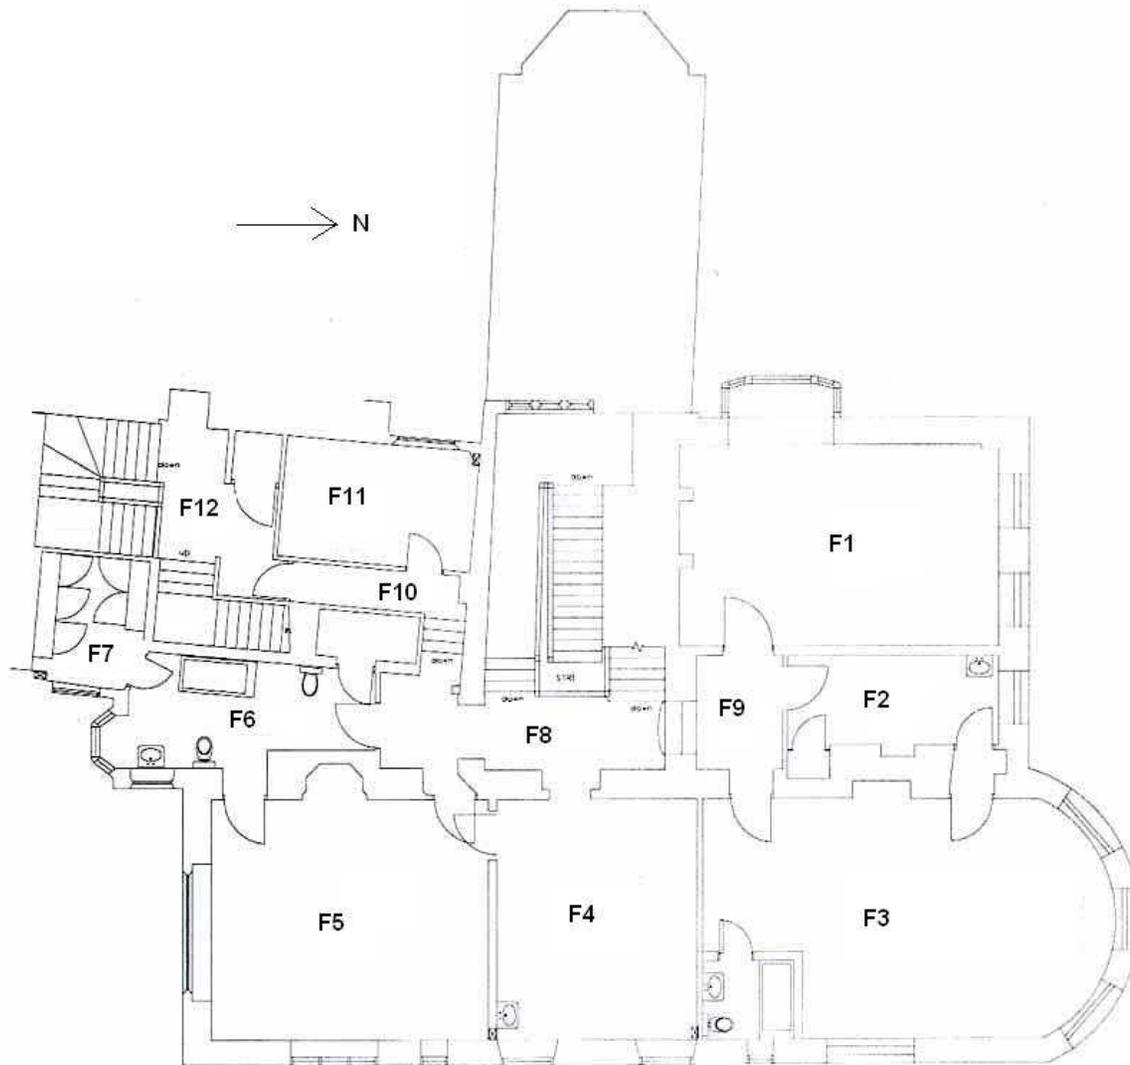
First-floor plan of Greys Court, showing the room numbers referred to in the text
